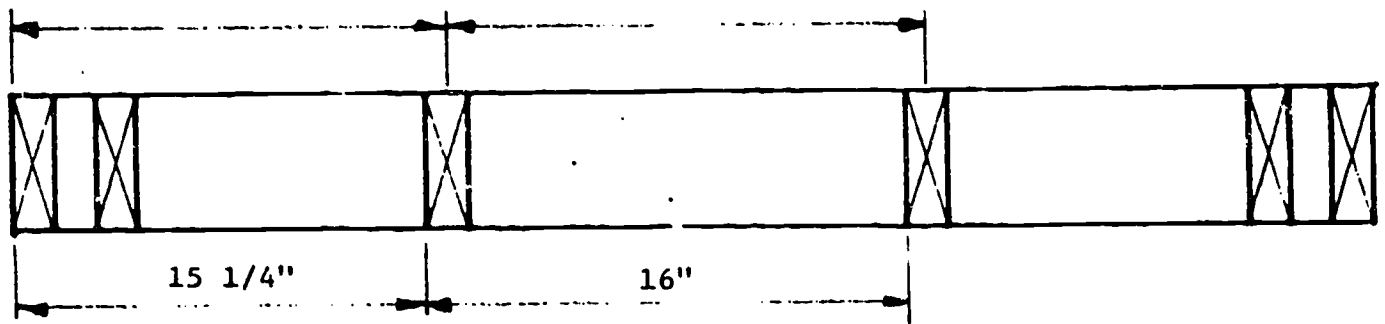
Standard Joist Spacing 16" OC and Additional Joist Layout
